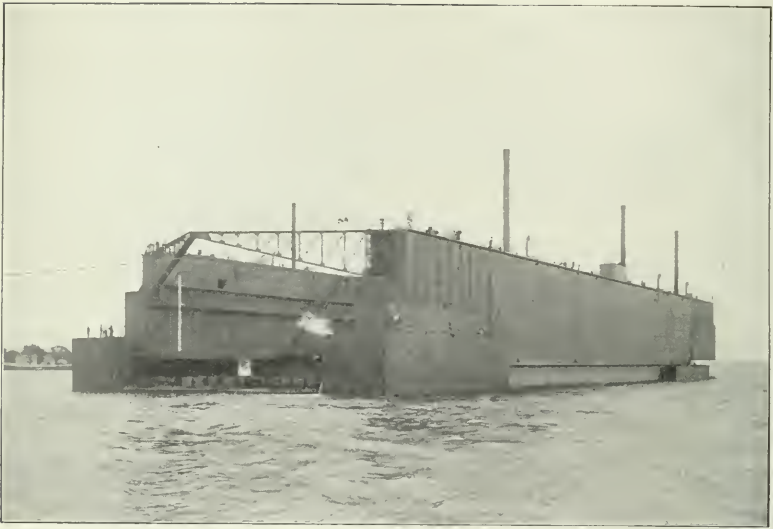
SELF-DOCKING: STERN PONTOON SUBMERGED AND DRAWN UNDER CENTER PONTOON;
